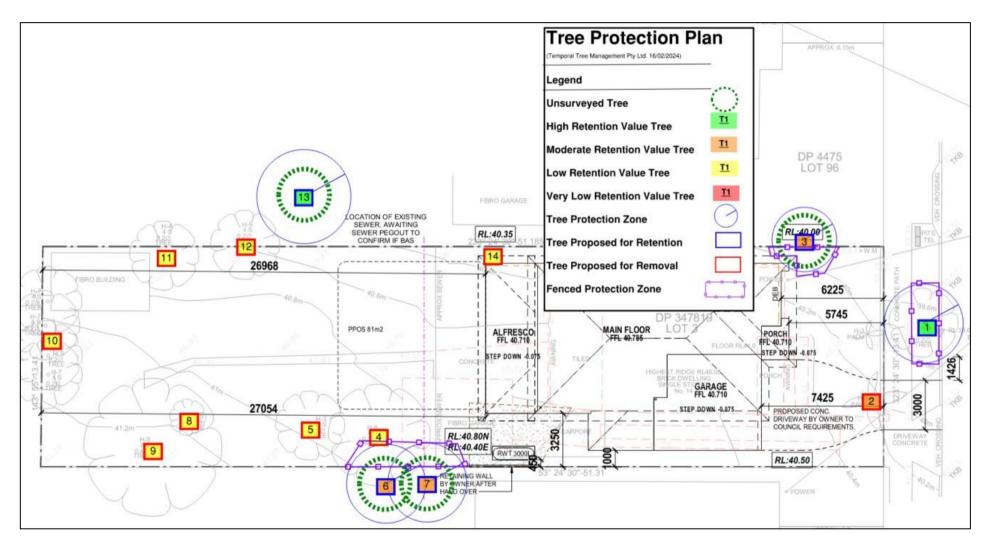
Tree Protection / Removal Plan for proposed development. *Proposed Site Plan* as prepared by *Masterton*, Job No: 2018920, Sheet No. 01.00, Rev. 1, drawn 19.10.2023. Annotated by Temporal Tree Management Pty Ltd. (16.02/2024).
